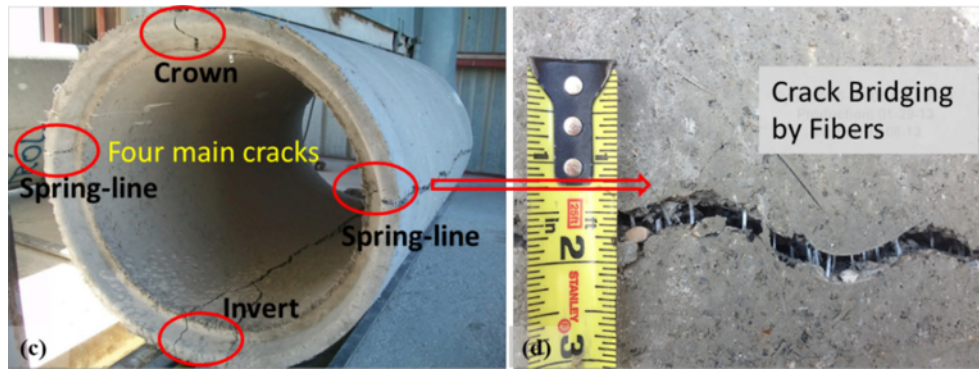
Typical flexural failure patterns and crack bridging by fibres of fibre-reinforced DCC pipe [30].
